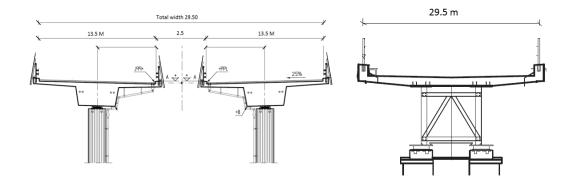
The design proposal of reinforced concrete bridge and steel composite bridge
